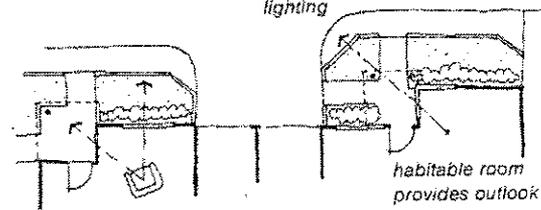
Security in residential streets and public open spaces are improved when buildings and dwelling entrances face streets and public open spaces. (Source: Better Urban Living.)
